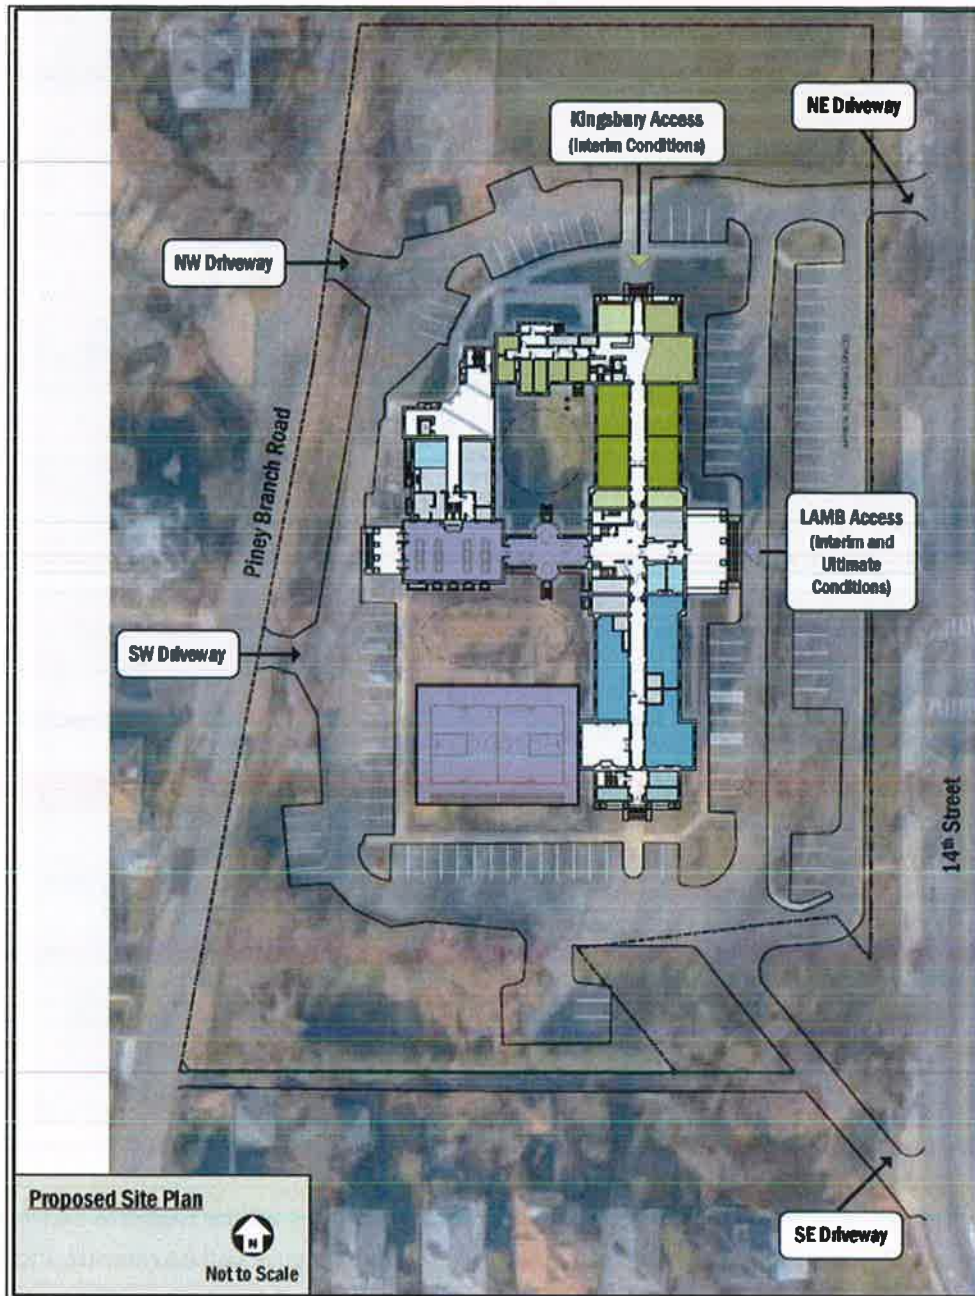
Proposed Site Plan (Source: Gorove/Slade, 9/5/17 CTR, Figure 5)
